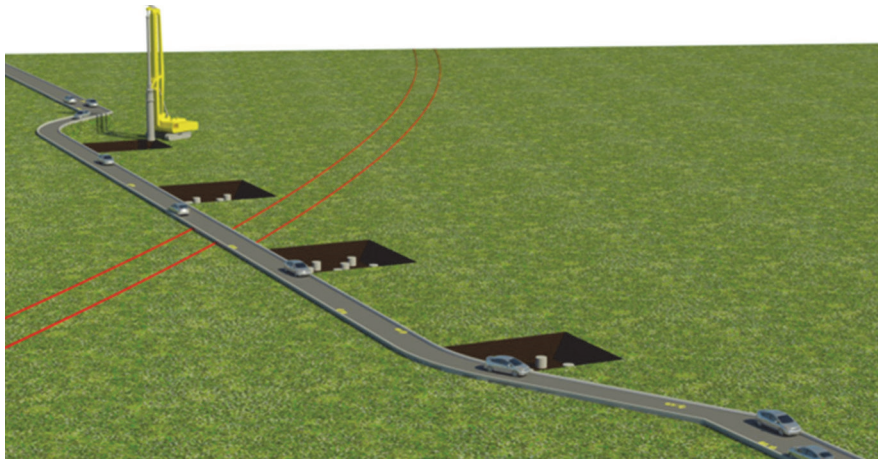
Excavation till bottom of pile cap and chipping of pile head
